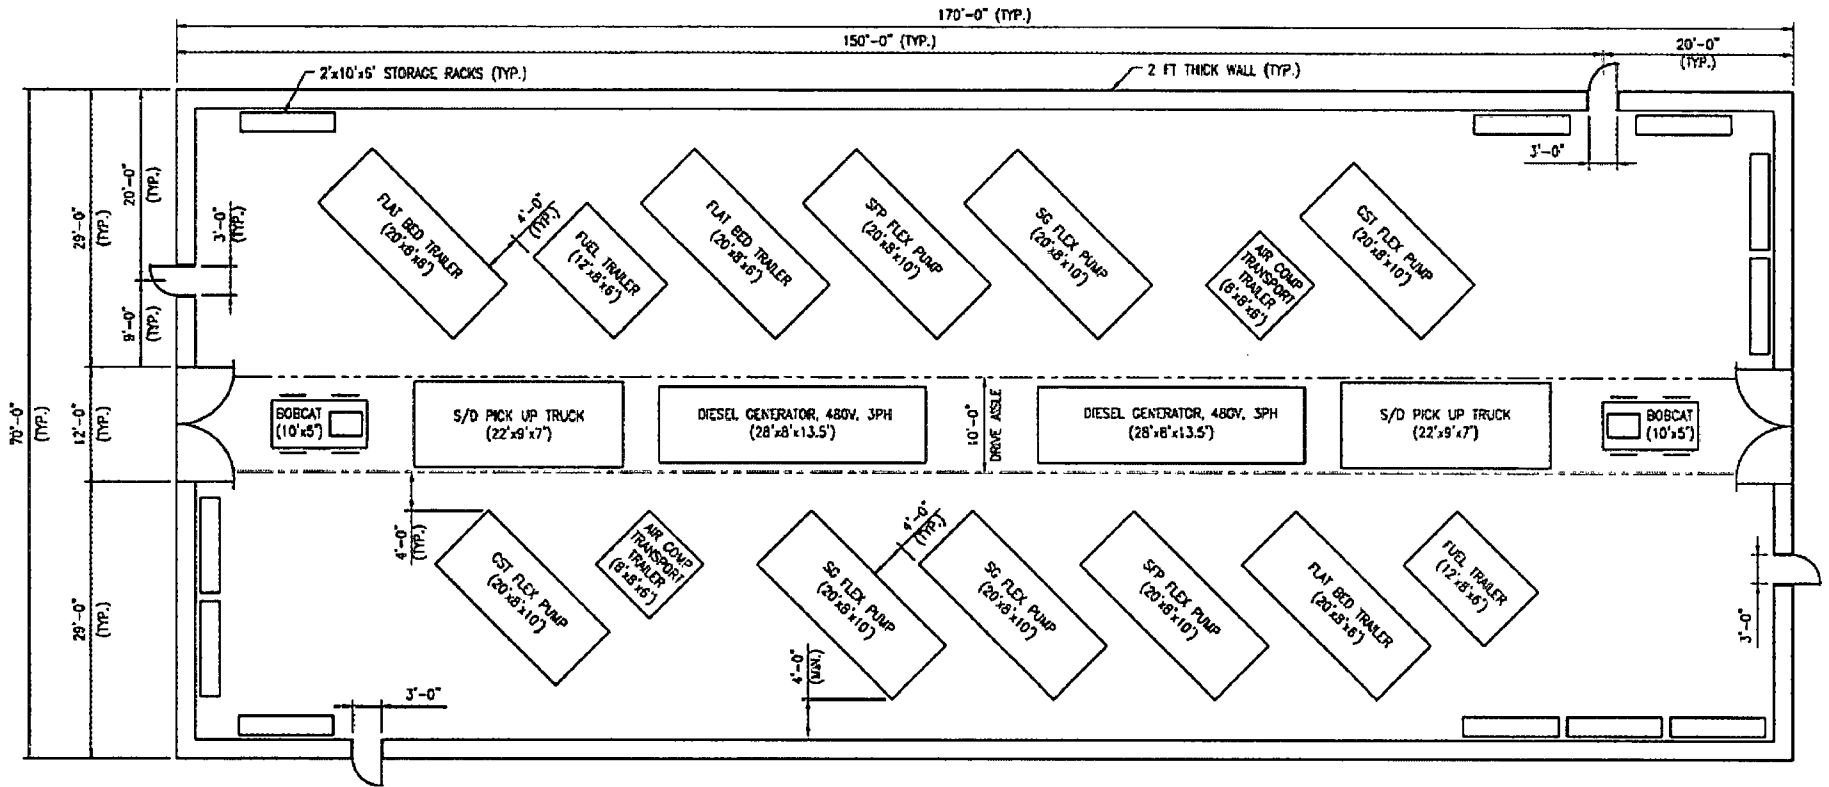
Proposed FLEX Equipment Storage Building (FESB) Layout
